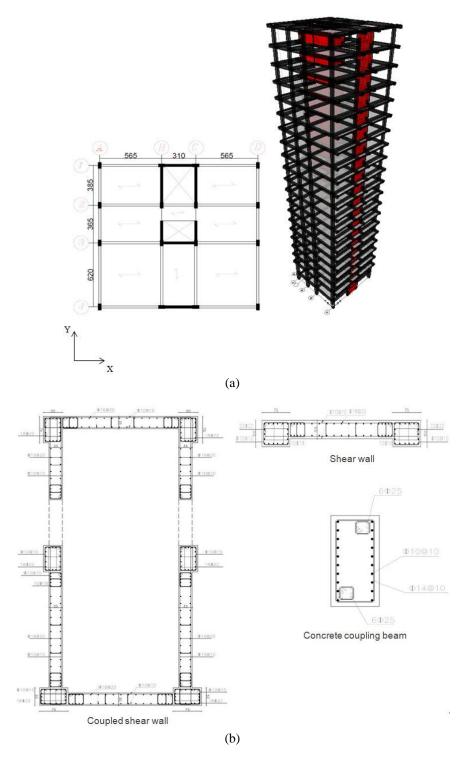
(a) The structural plan & elevation of the models; (b) details of RC coupled shear wall and concrete coupling beam of the fourth story in 21-story building
